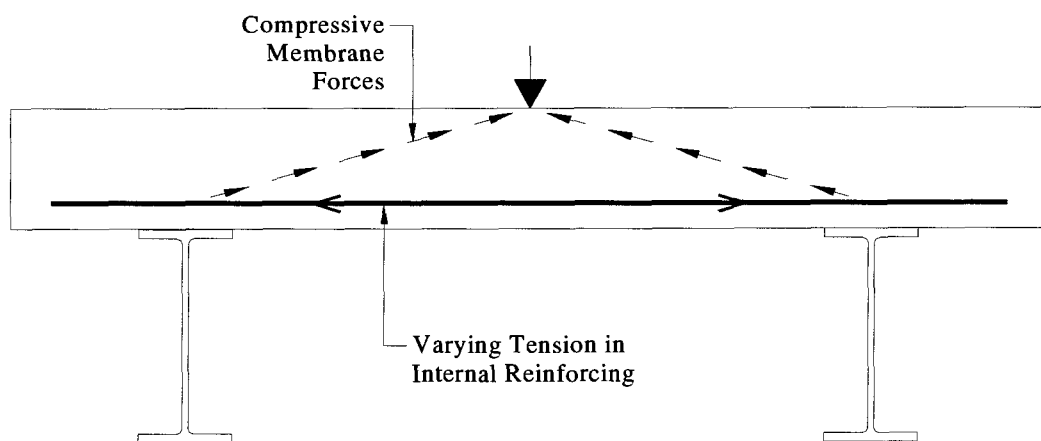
Arching Action in a Conventionally Reinforced Concrete Deck Slab
